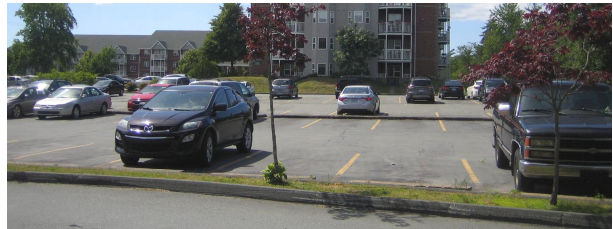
Looking west from the existing site driveway across the parking lot that will be used for the proposed building.
